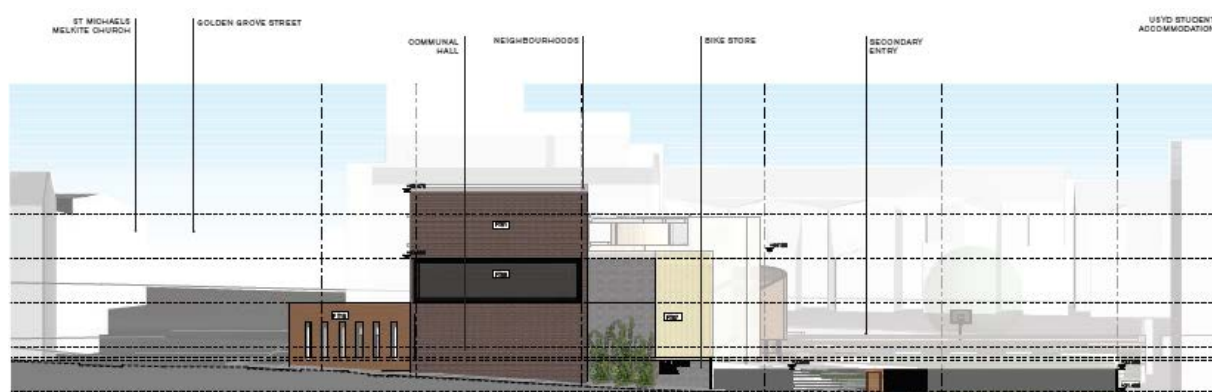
South elevation—Abercrombie Street elevation. (Source: FJMT, April 2020)
